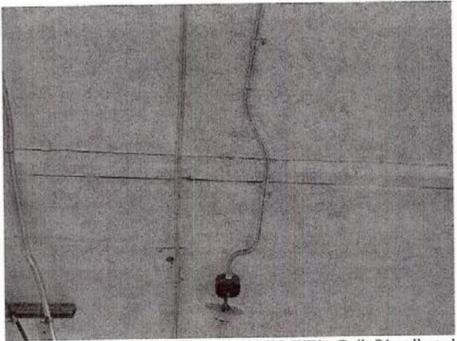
Lead bulk paint sample 120612-WWA-Bulk-P1 collected from Basement hallway ceiling adjacent to Converted IFR.
